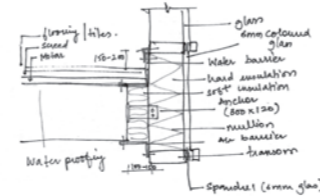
Sketch showing the detail fixing of the stick system facade at slab level indicating all the important elements by U. Tuli
